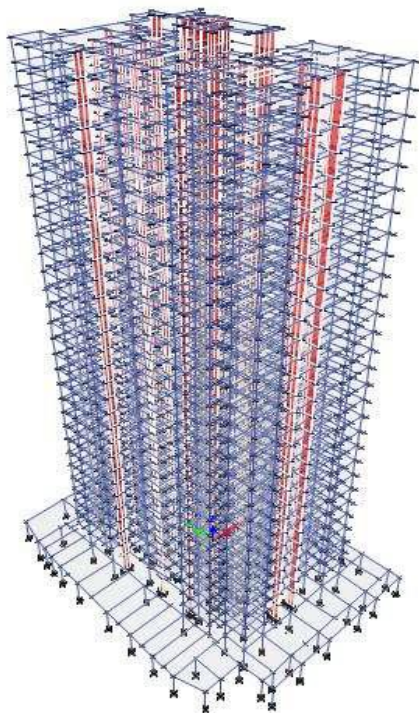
3D RENDER VIEW OF G+30 (Tall Structure)
